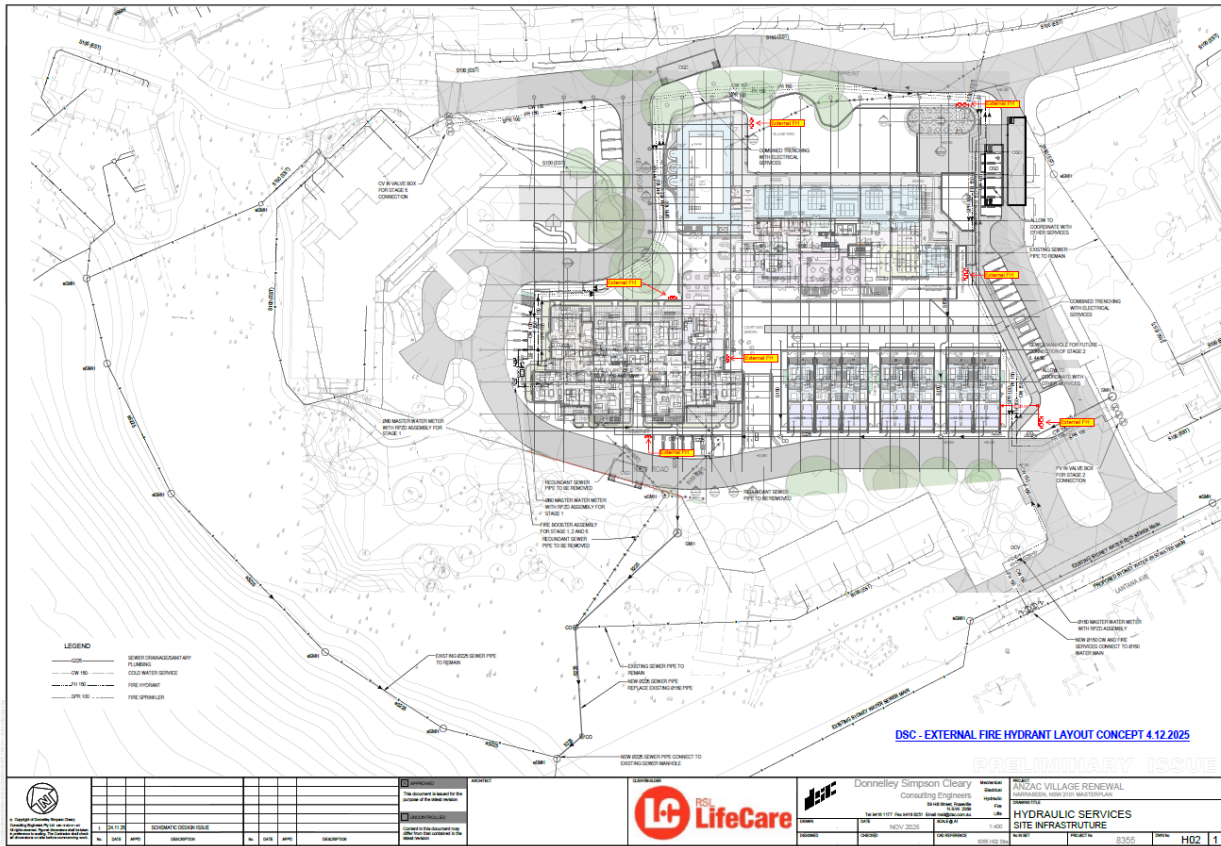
Plan showing the new external hydrants to the proposed Stage 1 development
